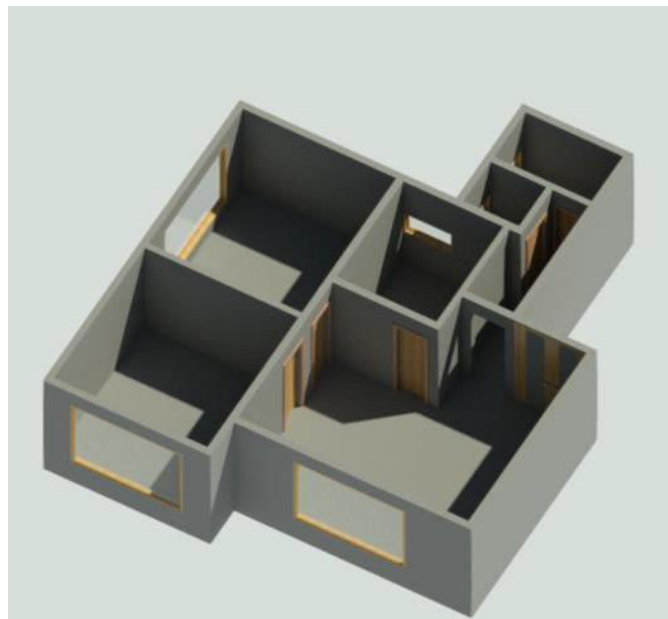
Plan View of 740 ft<sup>2</sup> single-story house (*Source: Naya Pakistan Housing and Development Authority Website*)
